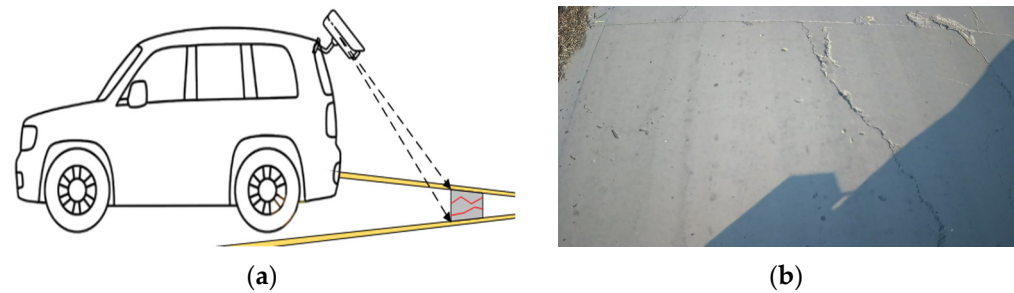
(a) A pavement management system that detects pavement damage. (b) A typical rural pavement with crack damage.
